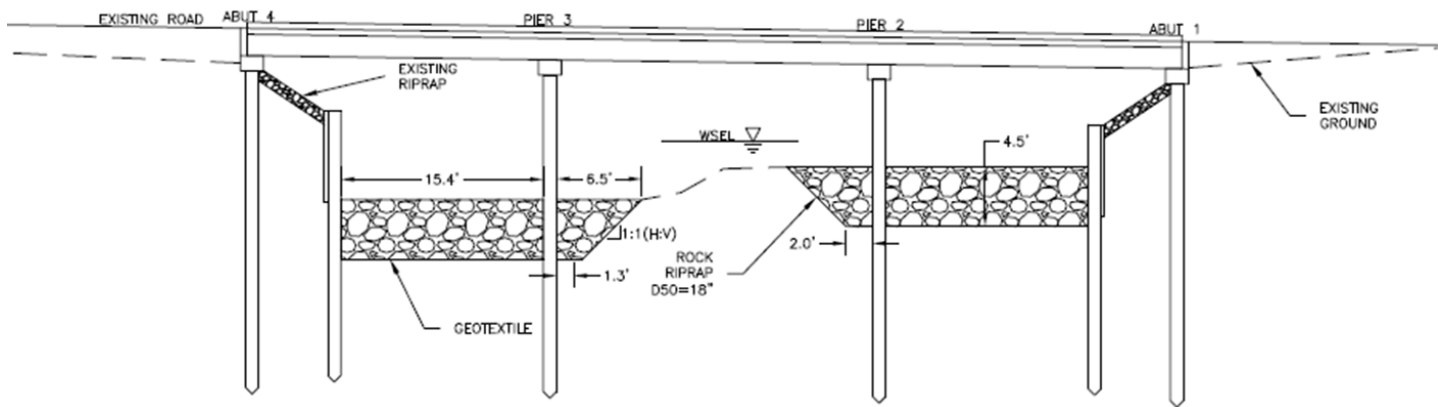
Cross-sectional view of Bridge H-13-G with recommended hydraulic scour countermeasures
